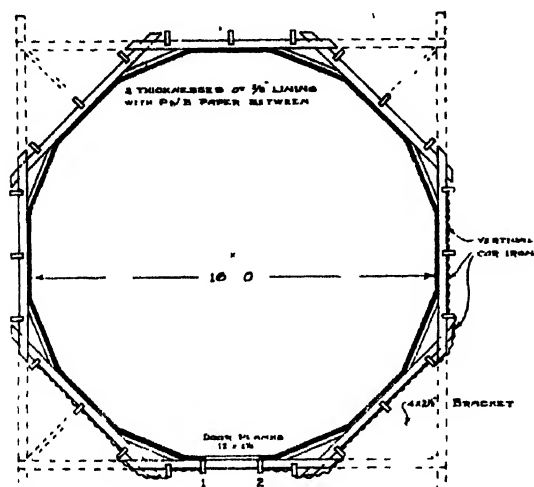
Plan of Frame Silo, showing extension of top plates for roof.
